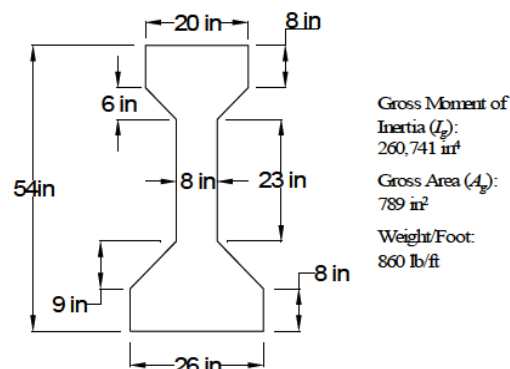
Case PB3. Girder of Mn/DOT Bridge No. 73023 (dimensions in mm)
